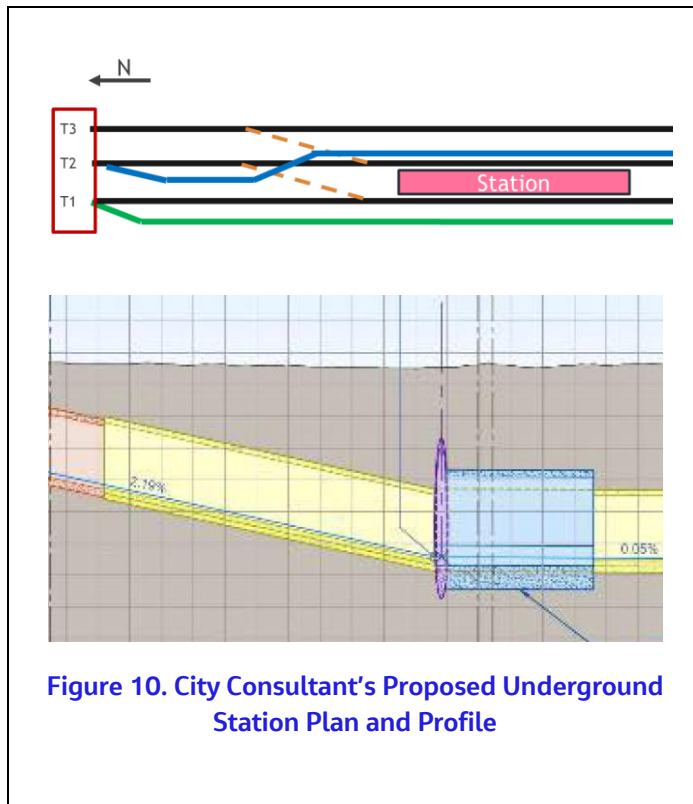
City Consultant's Proposed Underground Station Plan and Profile
